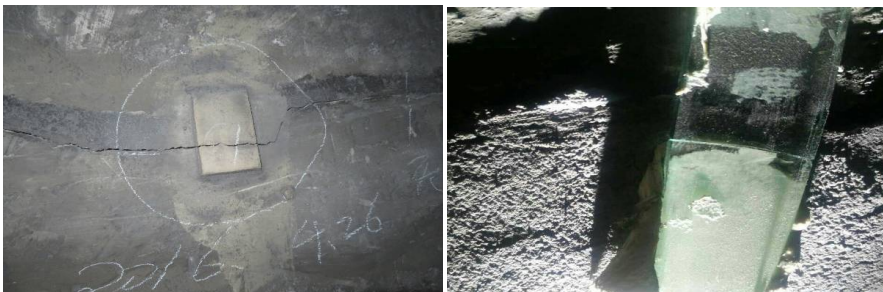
Cement ash block observation and glass observation of side wall cracks
